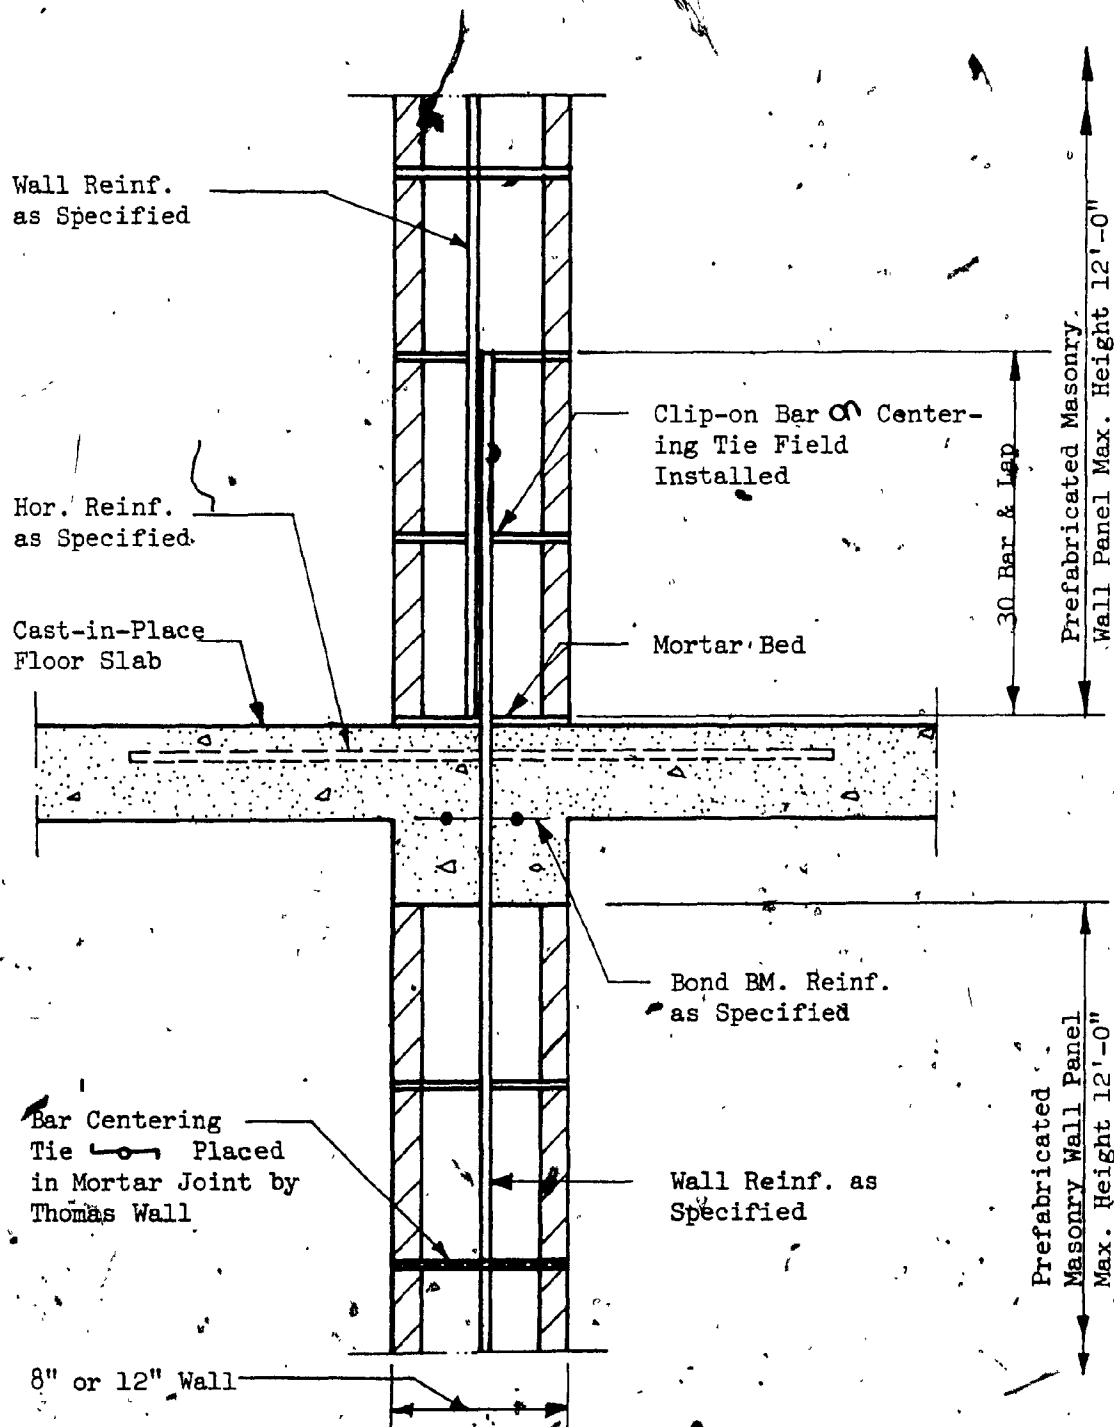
Typical Panel Connection at Floor (cast-in-place floor system).
